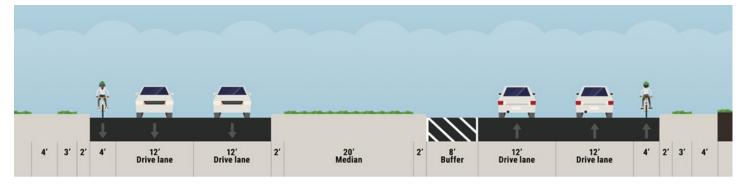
MELBURNE BOULEVARD/21ST AVENUE TO 23RD AVENUE
